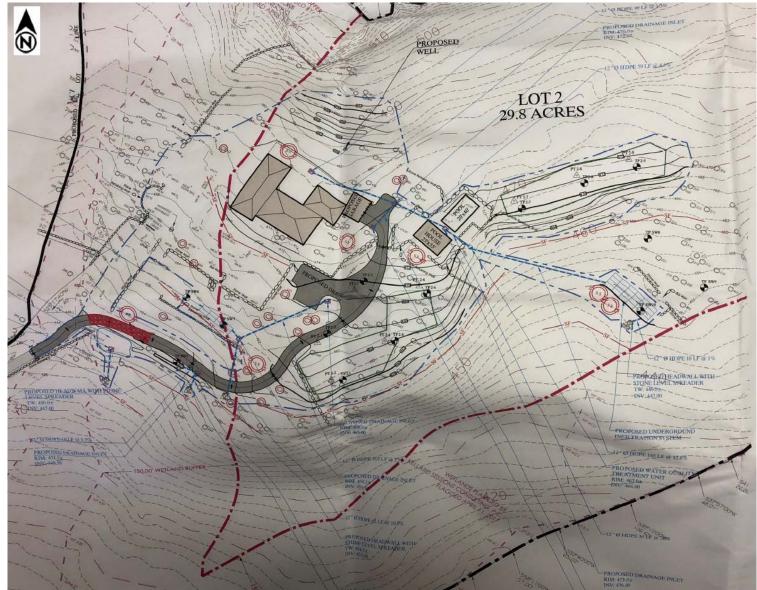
Barnegat Road Test Pit Locations Map 2
